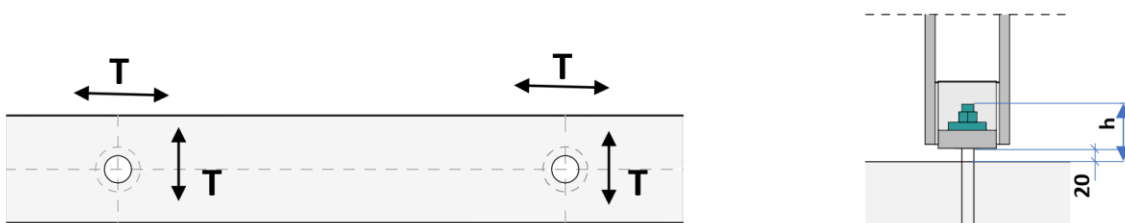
Installation dimensions and tolerances for RPP-E base bolts
